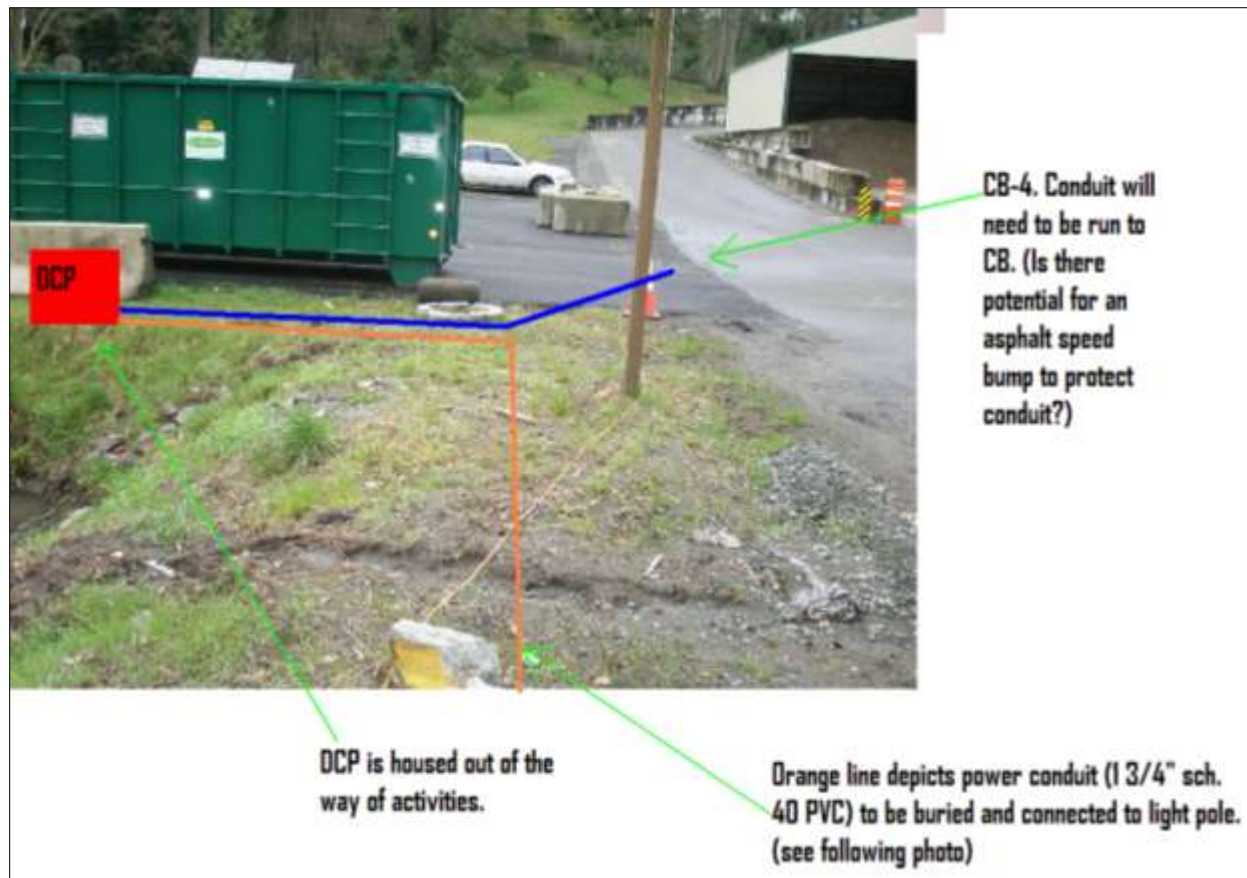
Monitoring of stormwater at catch basin #4 and layout for DCP and conduit at the Ballinger Maintenance Facility.
